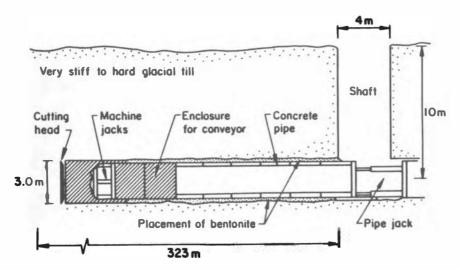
Cross-Section of Pipe-Jacked Tunneling for Nashville Sewer System, Chicago, Illinois (courtesy T.D. O'Rourke).
